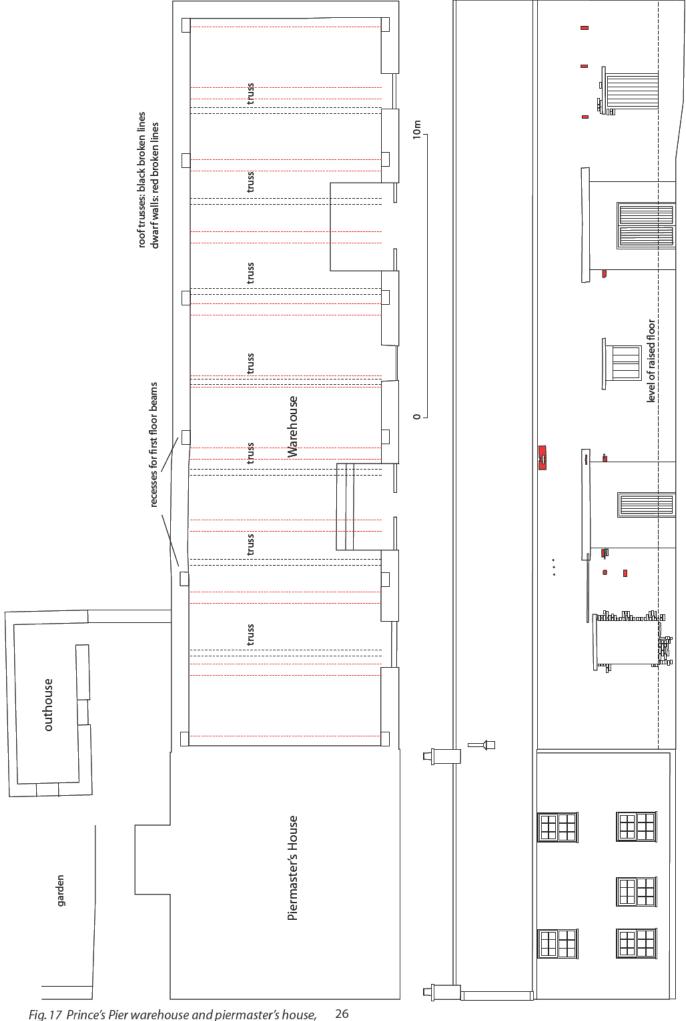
Prince's Pier warehouse and piermaster's house, 2 plan and elevation
